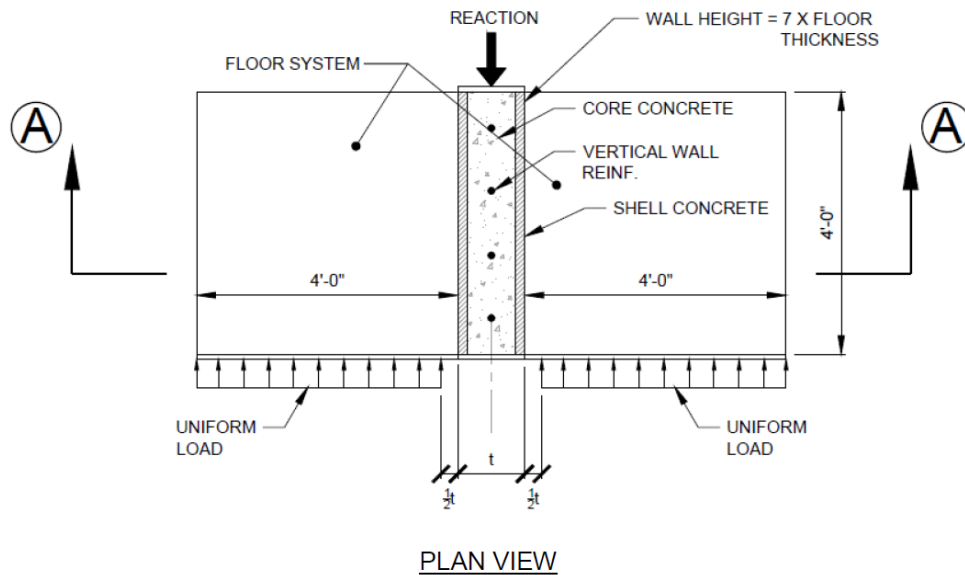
WALL CONNECTION LOAD TRANSFER TEST ASSEMBLY FOR OUT-OF-PLANE BENDING AND VERTICAL SHEAR EFFECTS AT WALL/FLOOR JOINT
